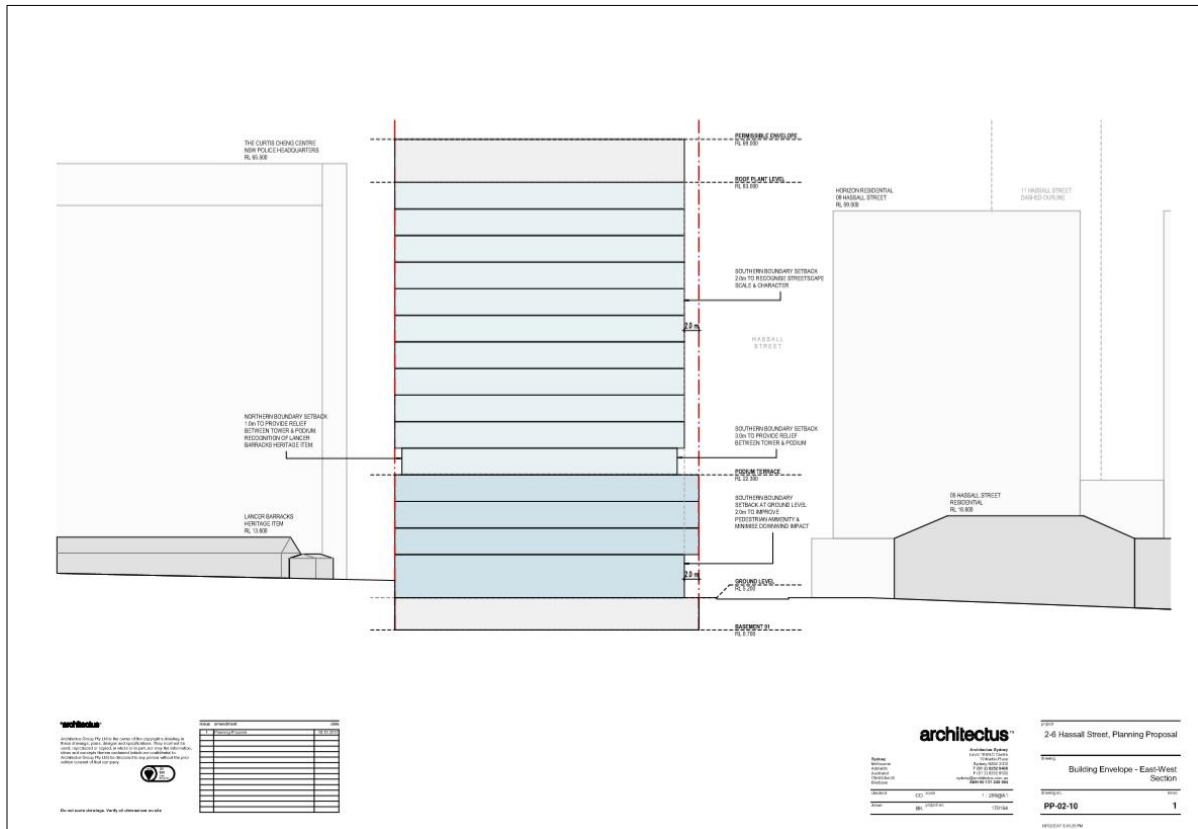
Building Envelope - East-West section. Plan of the proposed development. Source: Planning Proposal, Architectus 18/12/2017.
